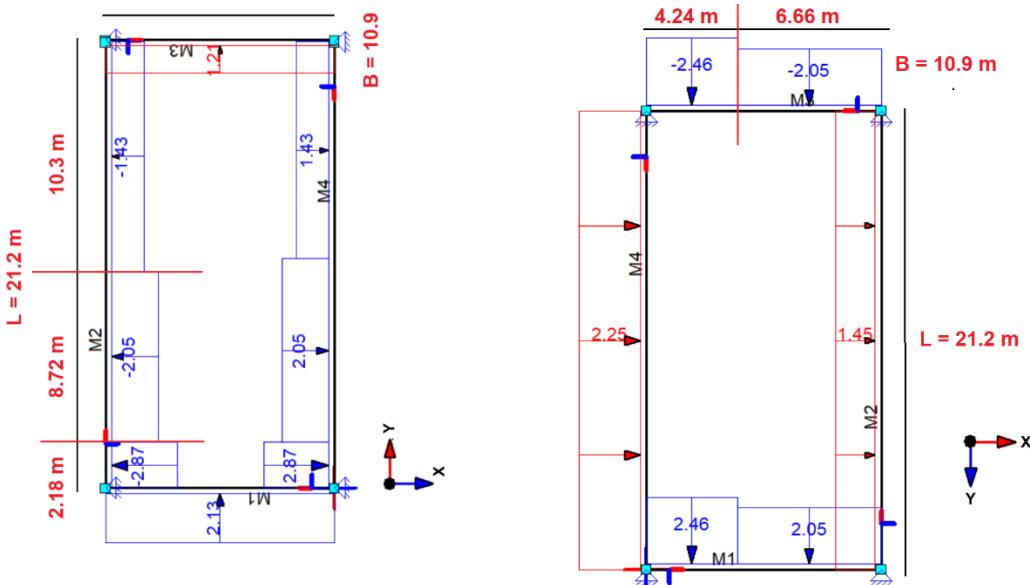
Wind Loads on Top Storey. (Right) Wind acting perpendicular to Long side. (Left) Wind acting perpendicular to Short side.
